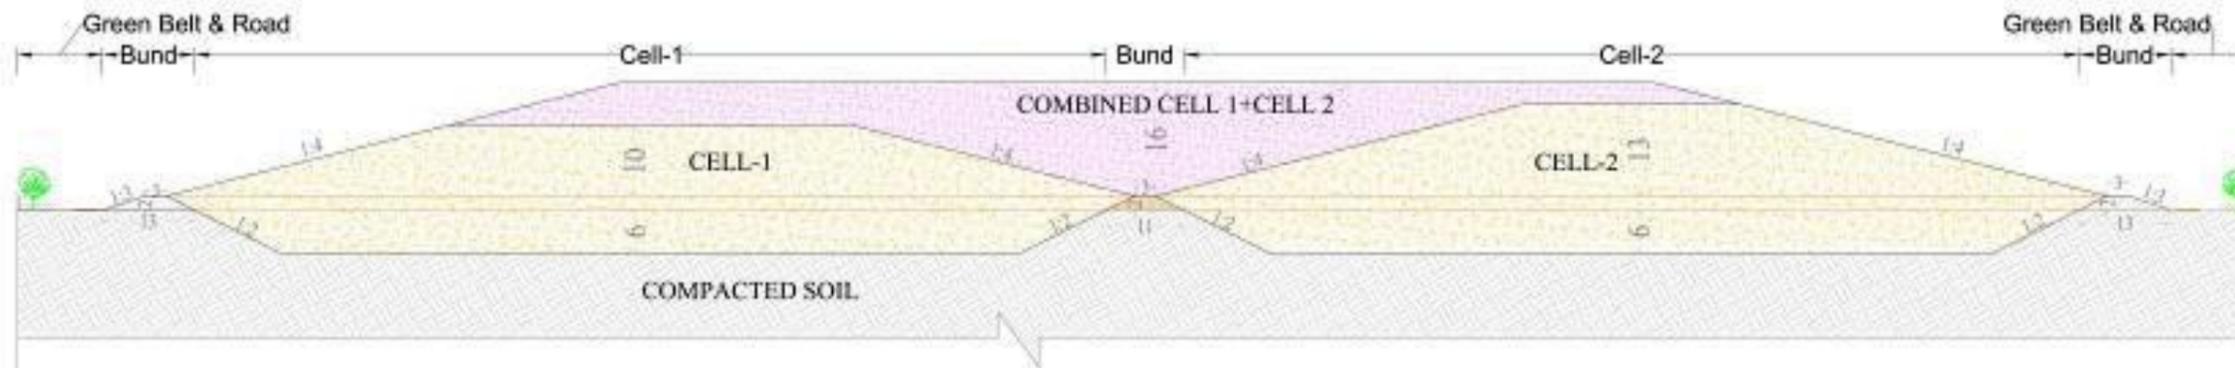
Tentative Layout Plan for Treatment and Disposal Facility
